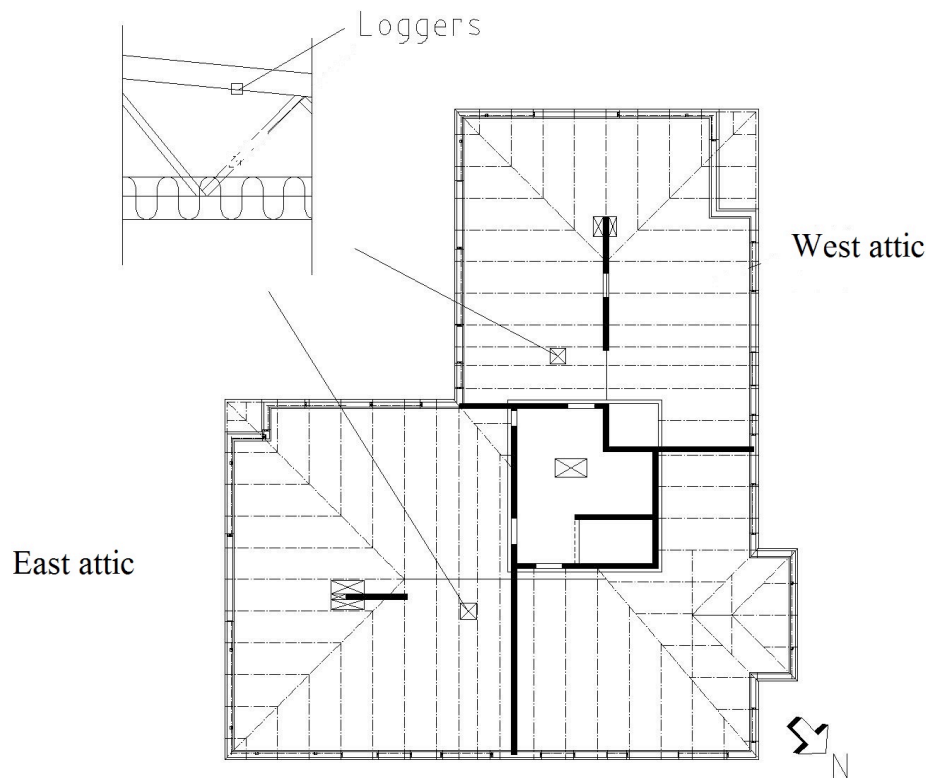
Floor plan of the attic space and the positions of the data loggers.
